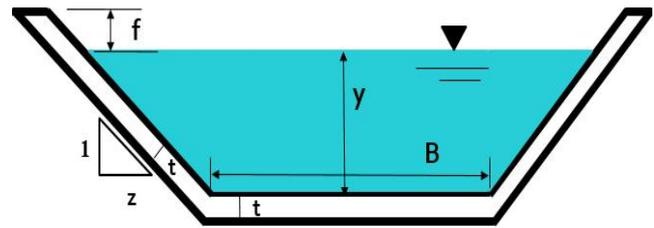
Cross-Section Of Trapezoidal Canal Section
